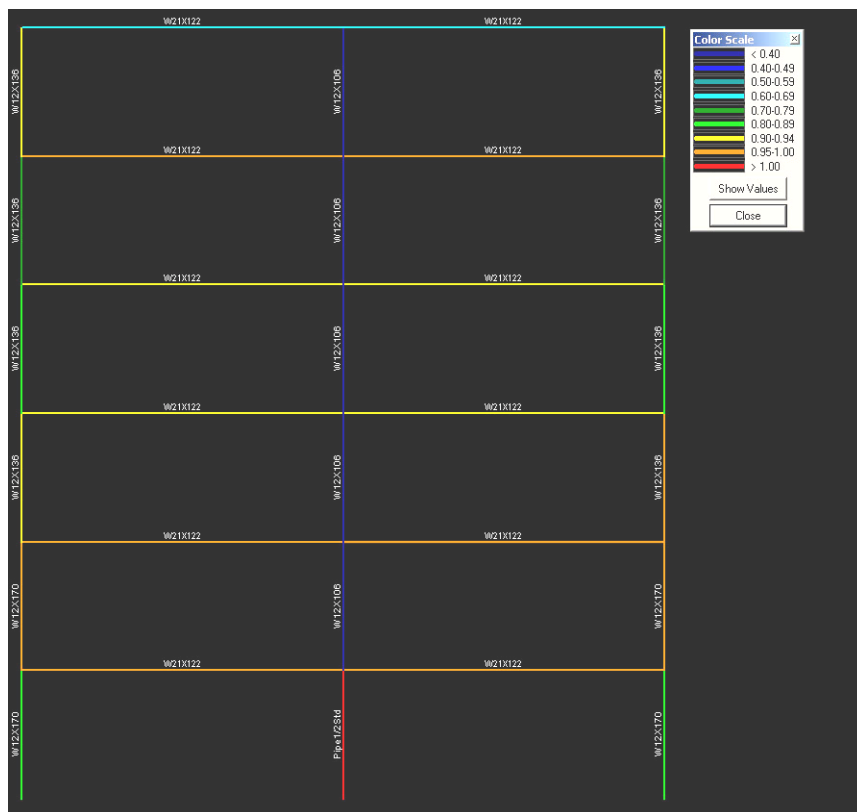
Ram Failed 1/2" STD Pipe (red column at base)
